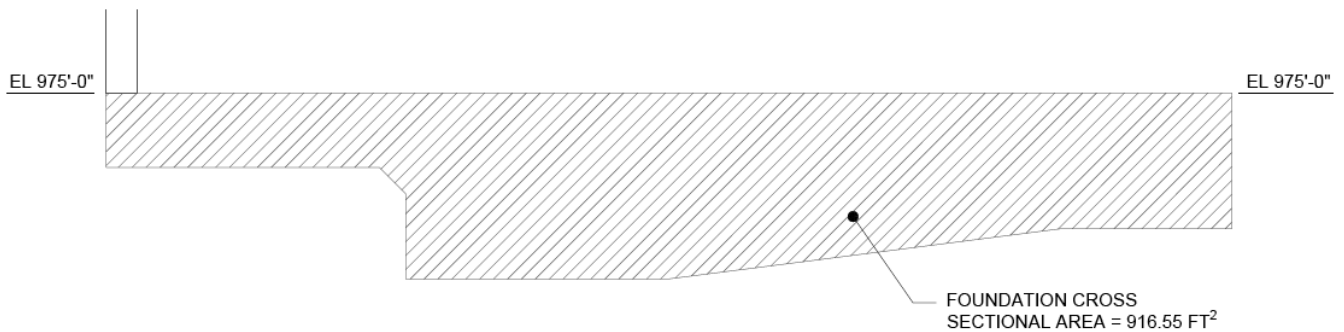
Northern Portion of Intake Structure Fdn; Cut Section Looking North
